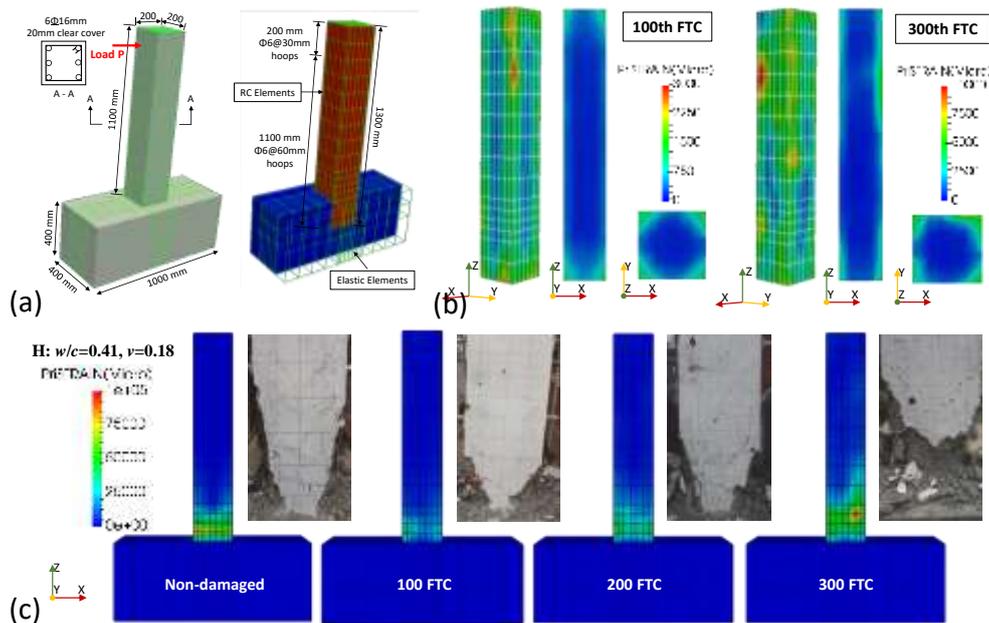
(a) RC column referring [3] (b) Frost damage profile (c) Failure pattern after loading
